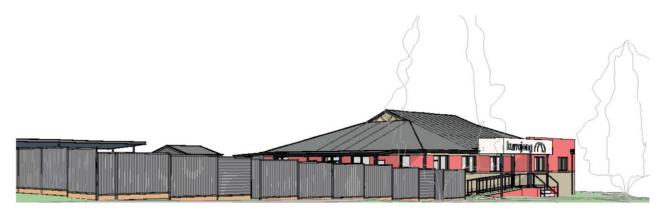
Proposed Kurrajong Office Development - Artists Impression viewed from East St & Elwin St streetscape
